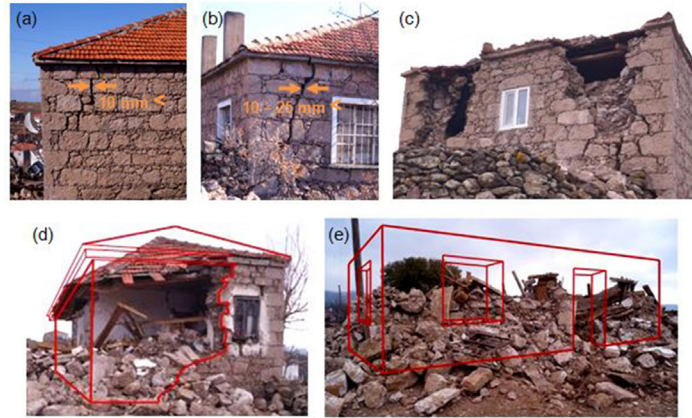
Building examples of the masonry structure according to the degree of damage: slightly damaged (a), moderately damaged (b), heavily damaged (c), partially collapsed (d), and completely collapsed (e).
